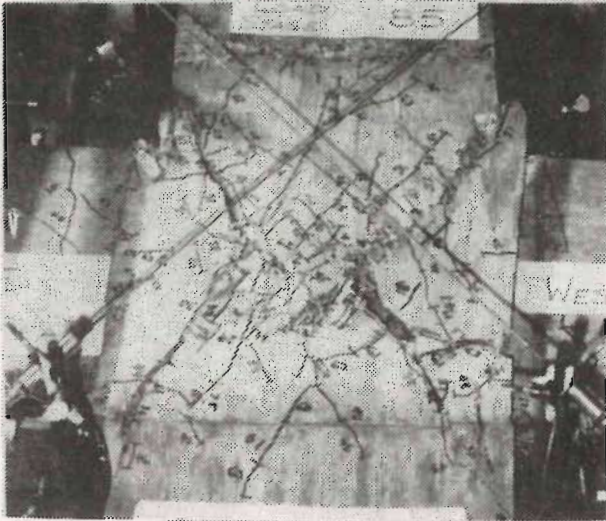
Compression failure of a joint with hinges under cyclic loading (Meinheit and Jirsa, U.S.A.)
